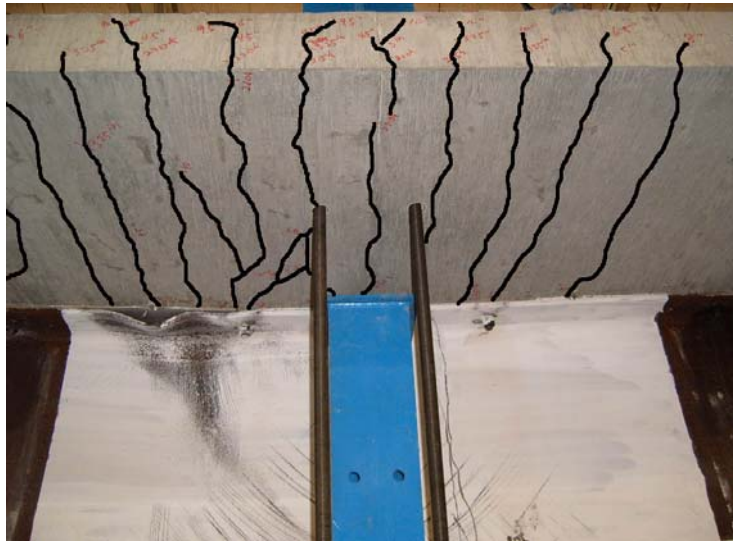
Specimen HASAA-30BS – Concrete cracks and beam local buckling (10-in. deflection)
